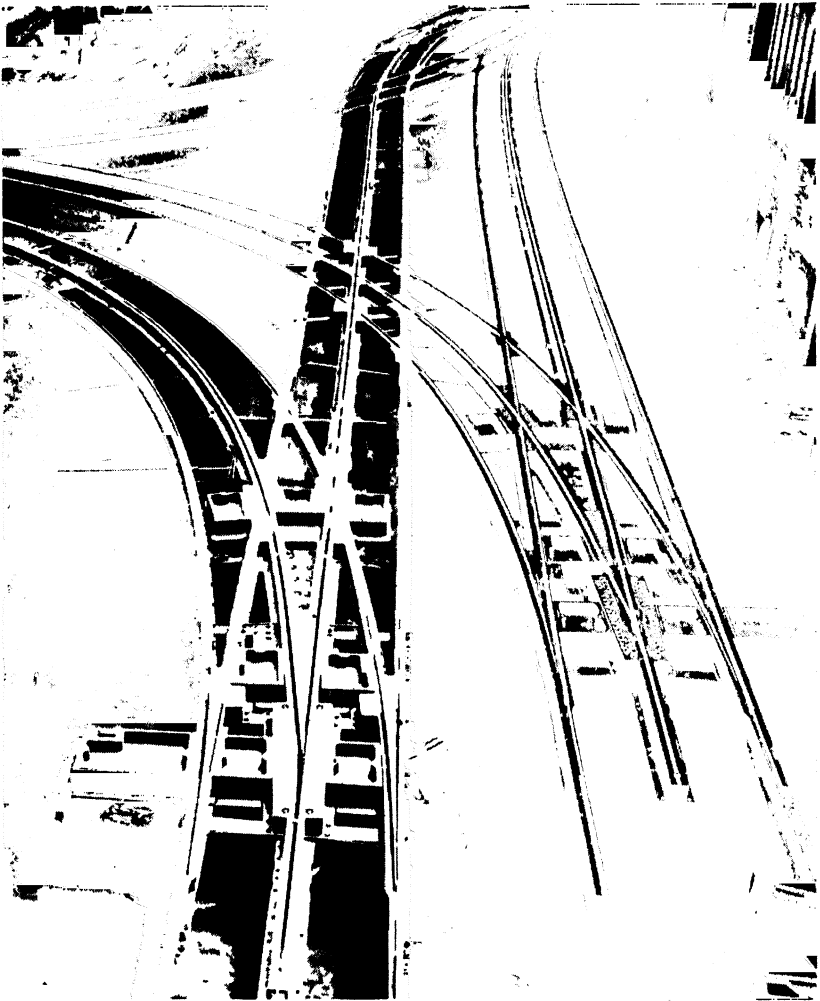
CONDUIT TRAMWAY JUNCTION
